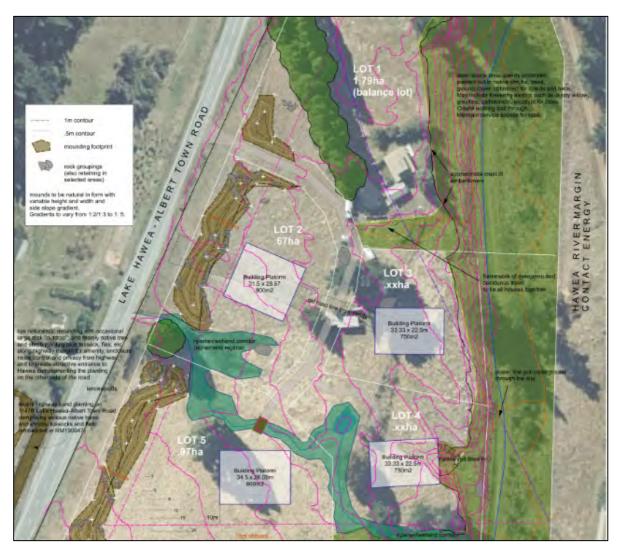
1172 Lake Hāwea -Albert Town Road (Sec 22 BLK III Lower Hawea SD - Proposed Lot Layout)
